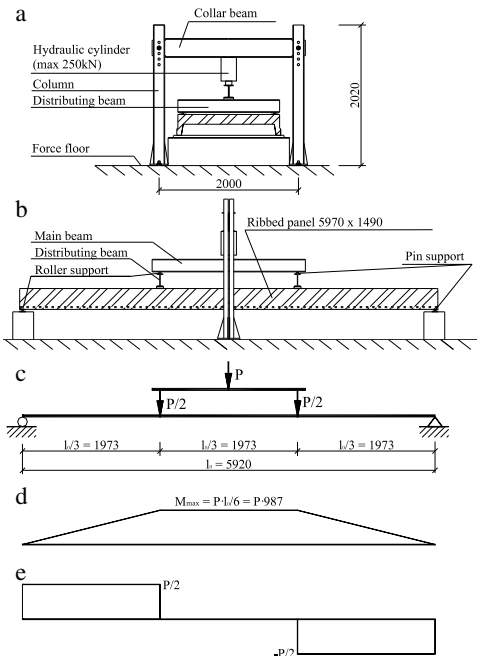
(a) End and (b) side view of the test device with (c) load, (d) bending moment and (e) shear diagram. Dimensions are in millimeter.
